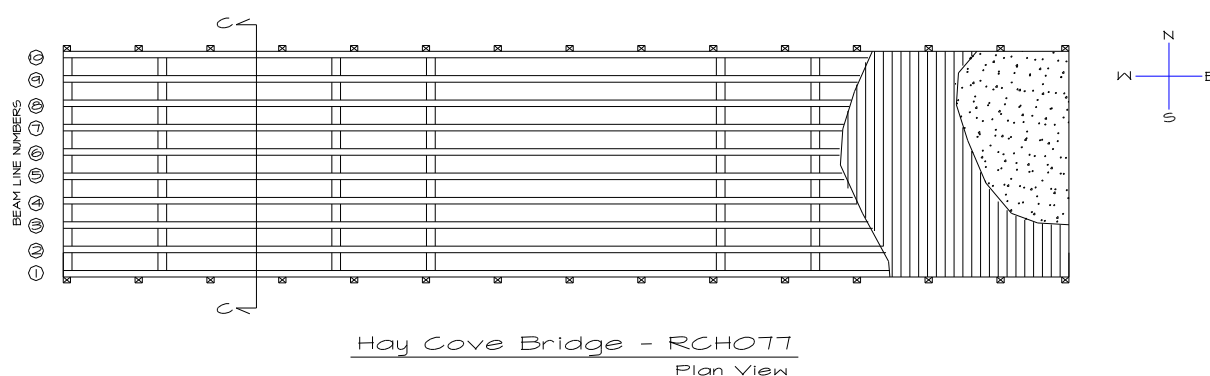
Hay Cove plan view showing girder numbering with respect to direction.
